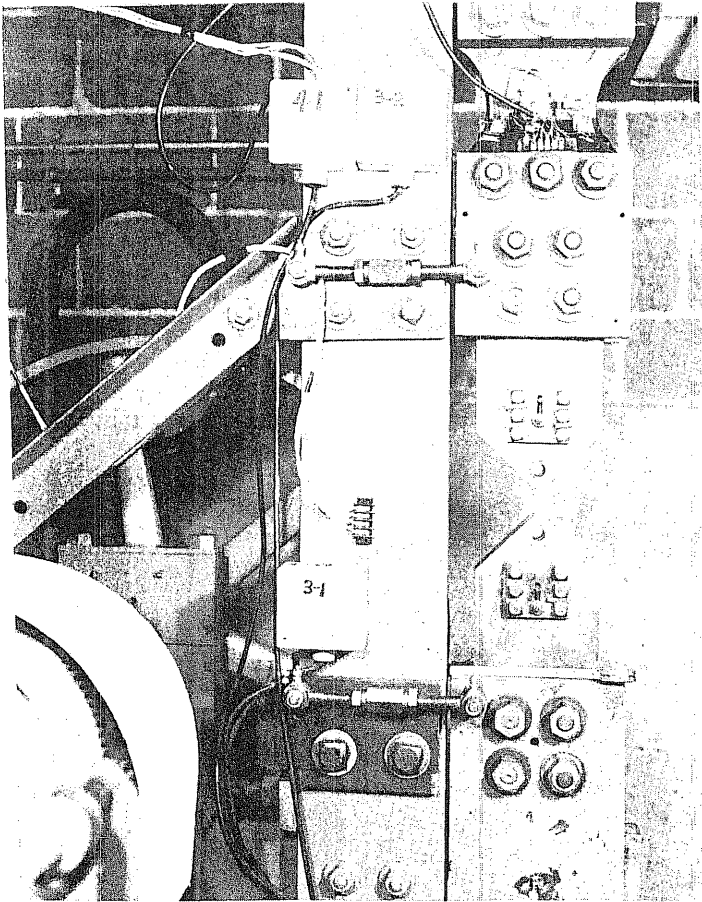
PULL-HEAD ASSEMBLY FOR FATIGUE MACHINE
